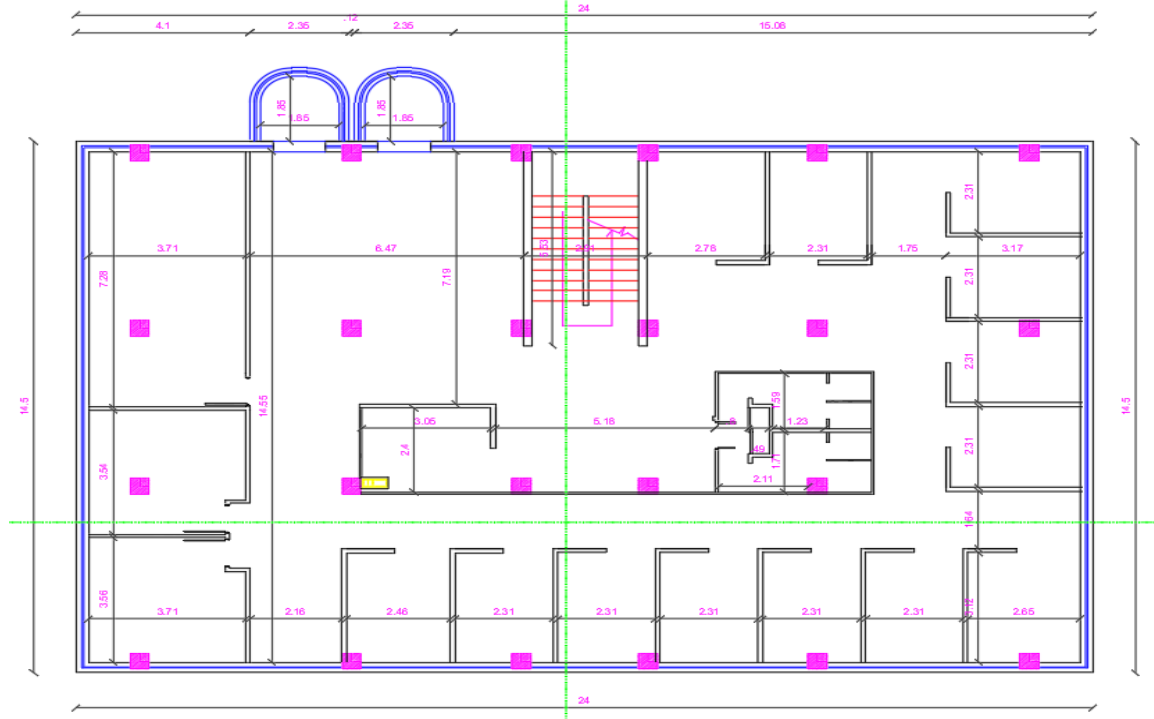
Ground Floor Plan and Repeated Floors 1, 2, 3, 4, and 5 Plan View
